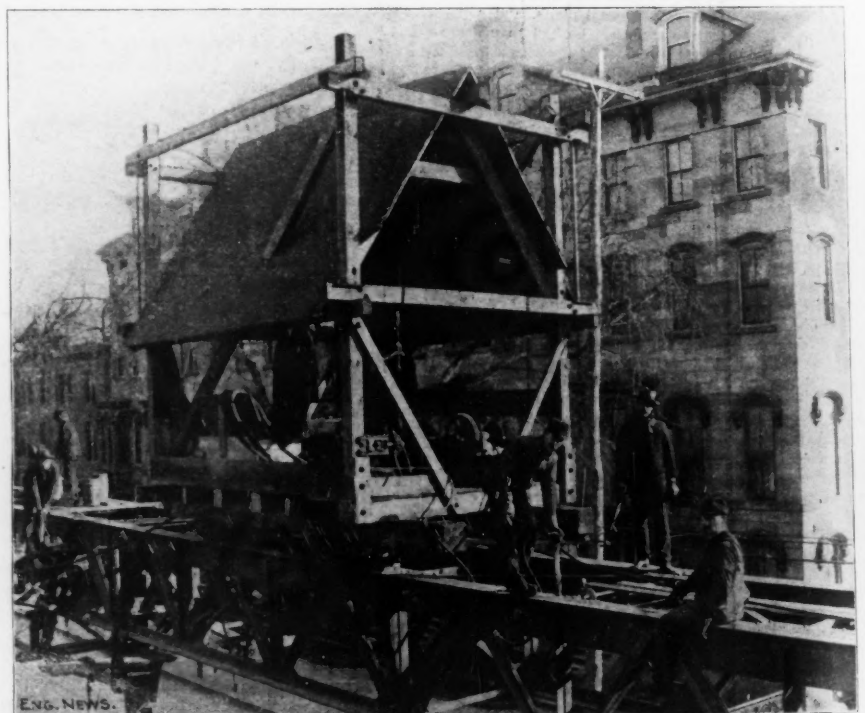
VIEW OF RIVETING TRAVELER IN OPERATION; BOSTON ELEVATED RY.
